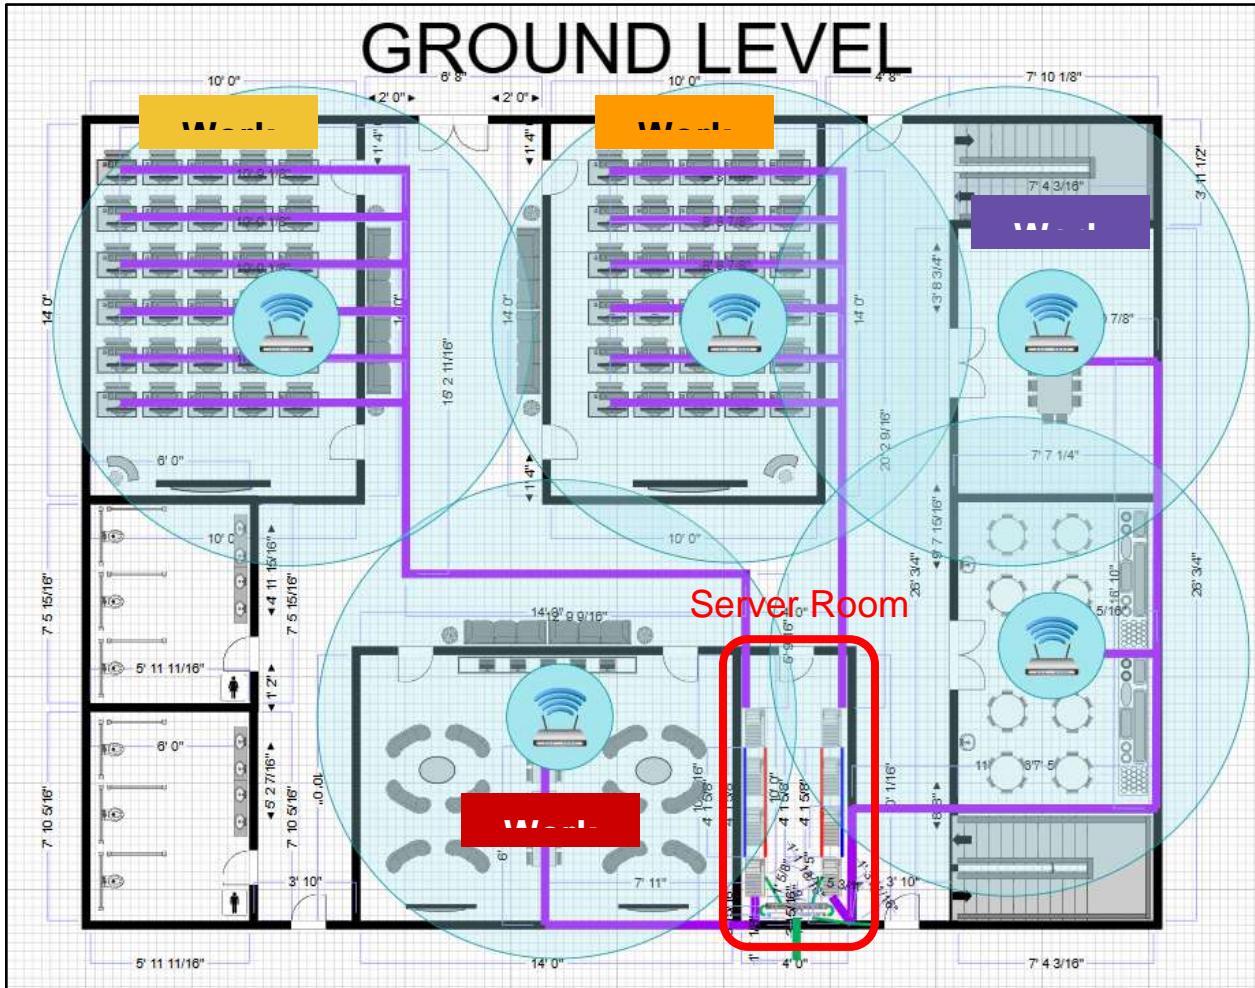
Physical Cabling and Connection Planning for Ground Floor (GF)
